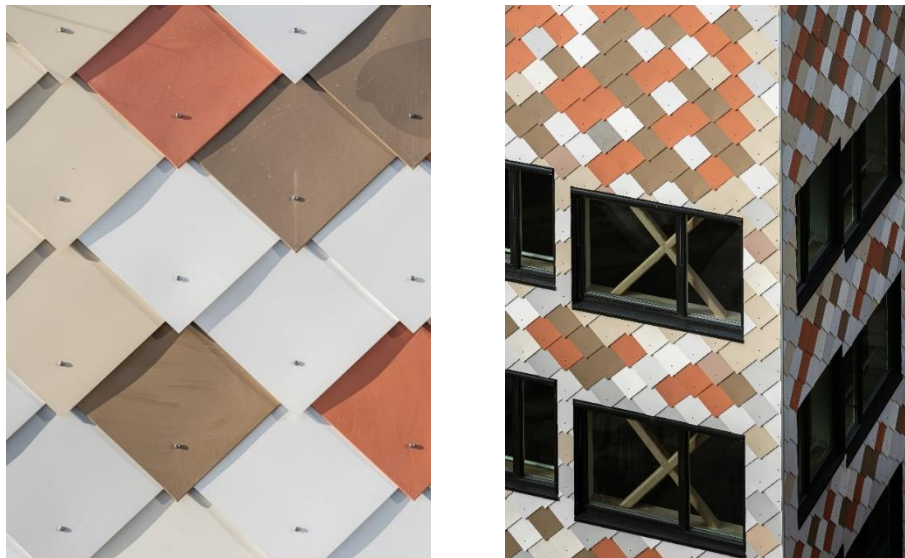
The reused façade cladding in KA 13 (Mad Architects, 2019)
